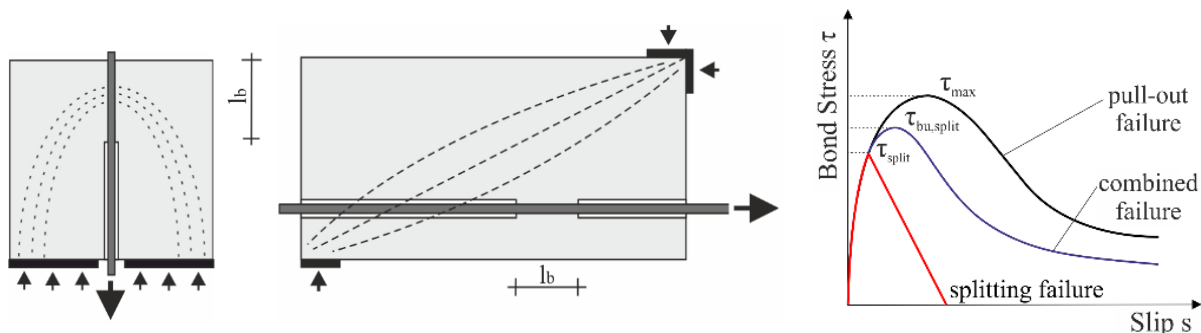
Schemes of pull-out test (left) and beam-end test (middle) and modes of bond failure (right)
